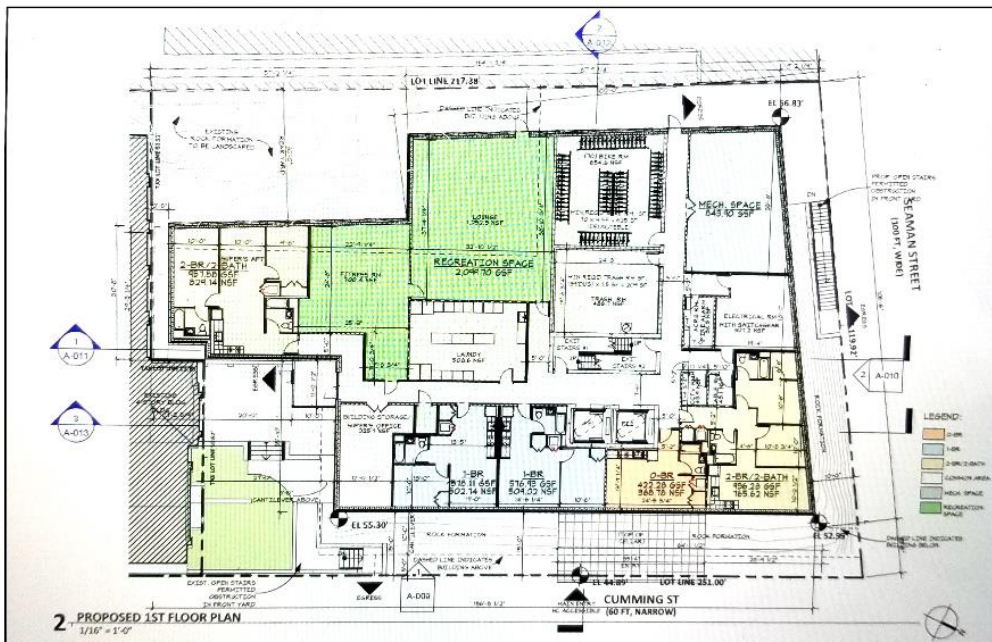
Ground plan of proposed building on Block 2237, Lot 16 (GFF Architects LLP)
